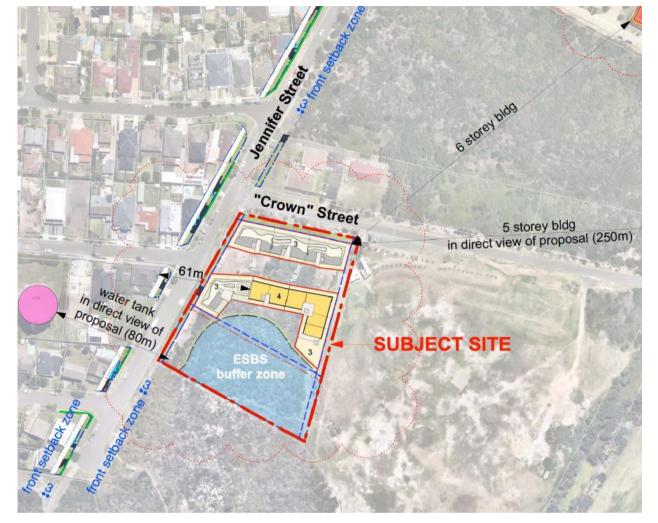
Proposed building layout and storey heights, illustrating separation to nearest residential property
